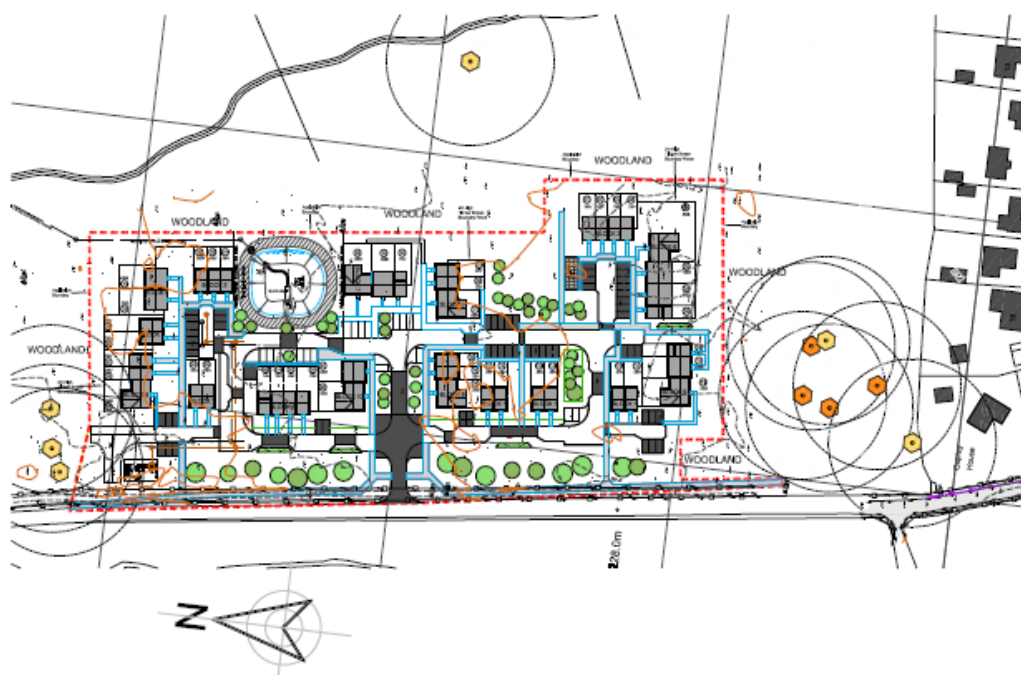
Proposed Layout – School Wood (Extract from Drawing No 3879/01-02 Rev B - for illustrative purposes only).
